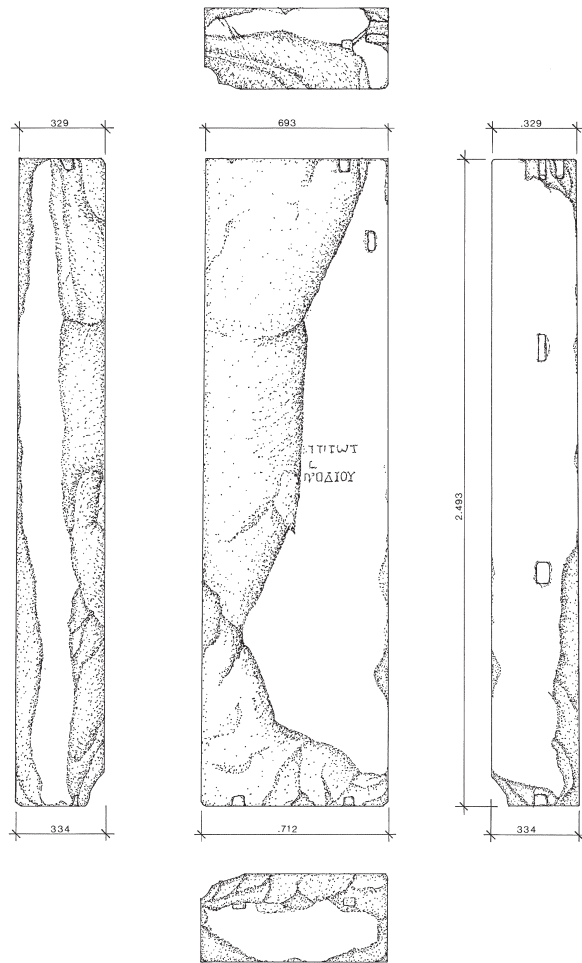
Doorjamb block M32. Drawing Amy Barnett.
